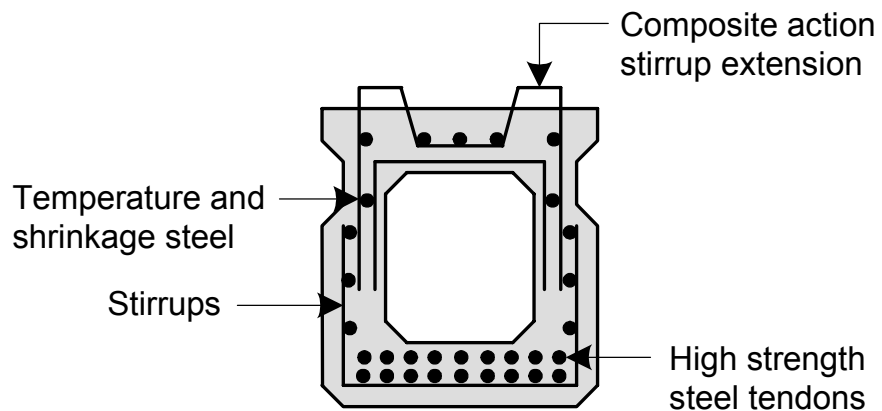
Schematic of Typical Prestressed Box Beam Reinforcement
